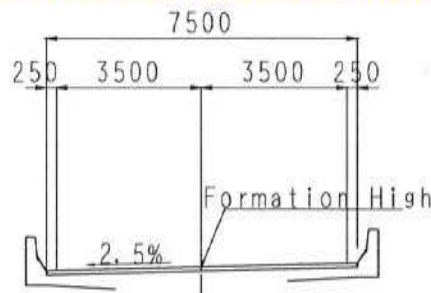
Typical Cross-section of Ramp Ways at Sewri Interchange
